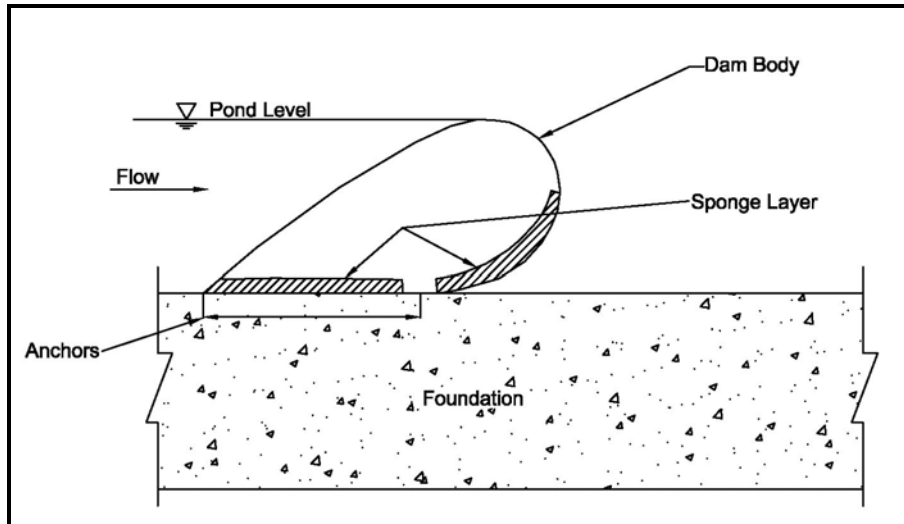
Typical Arrangement of Sponge Layers inside Dam Body
